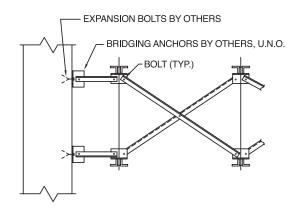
BOLTED CROSS BRIDGING SEE SJI SPECIFICATIONS
